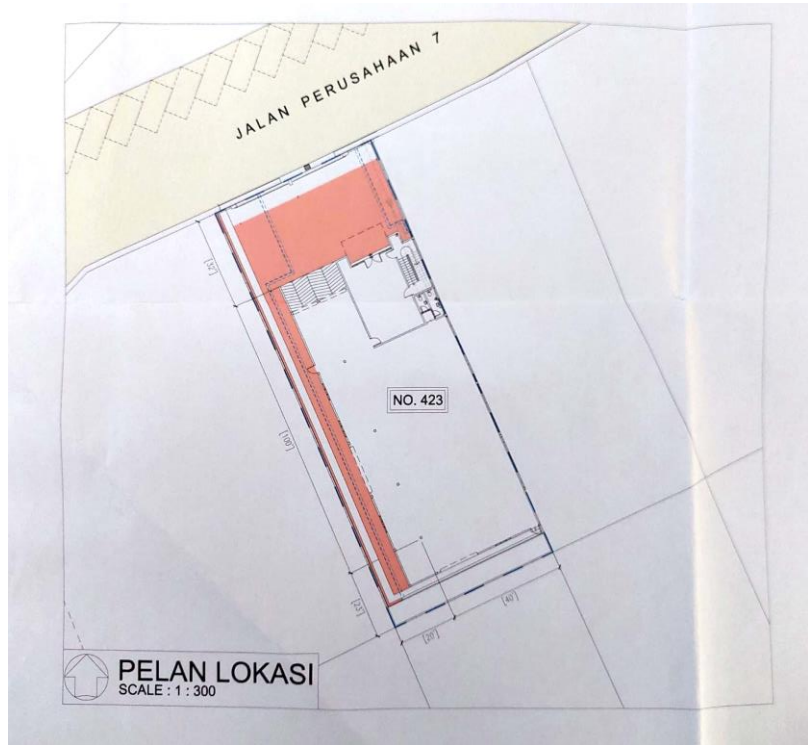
Site plan of Boon Lee Auto SDN. BHD
